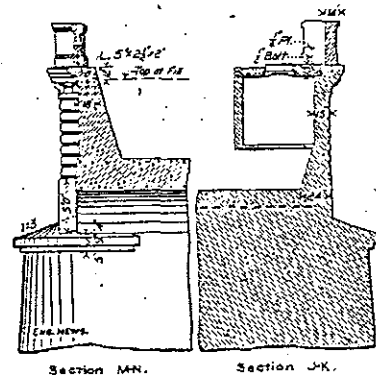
Cross-Sections of Grand Rapids Bridge.
